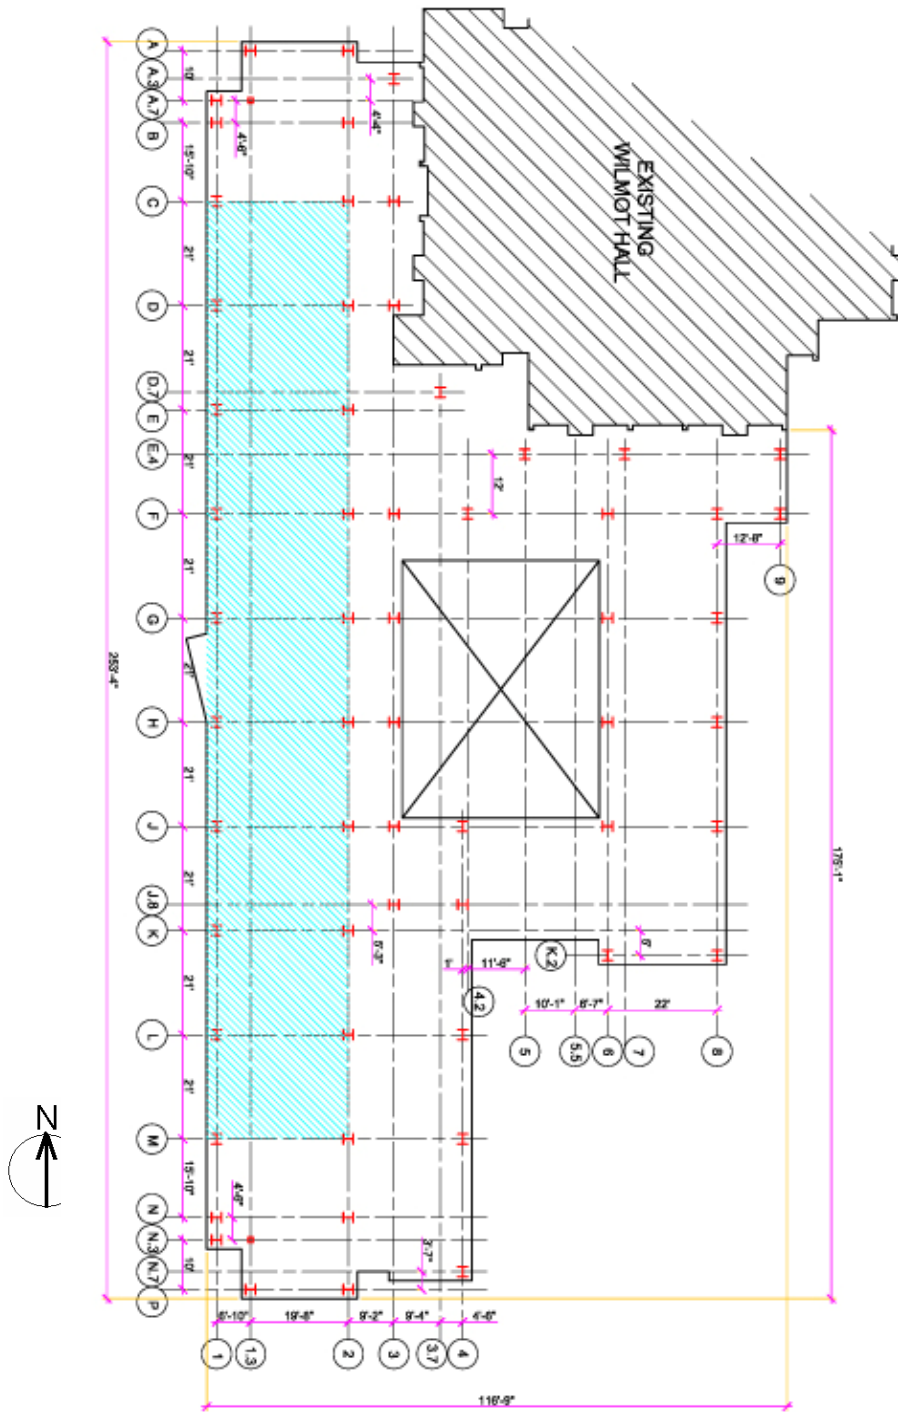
Typical Column Layout, Floors 2-5, Critical Bays Shaded
